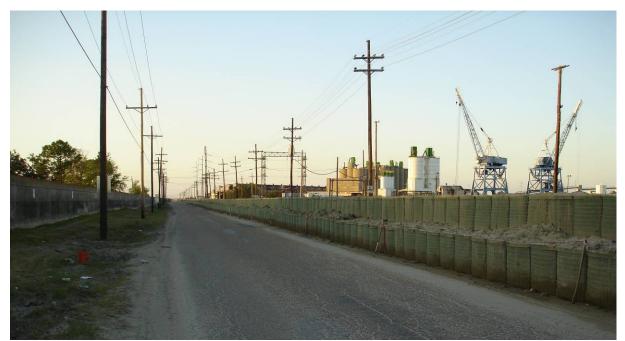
Temporary Bin Wall, IHNC northwest along France Road (L. Wooten)
